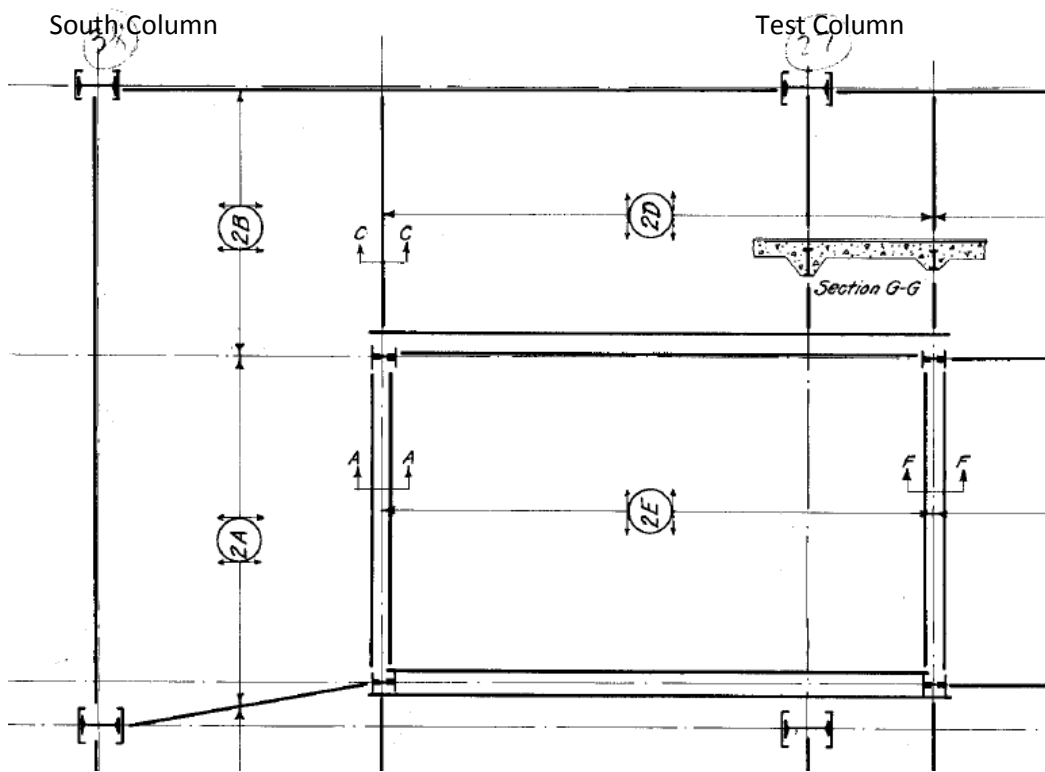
Plan view of second floor structural framing, showing column section geometry
